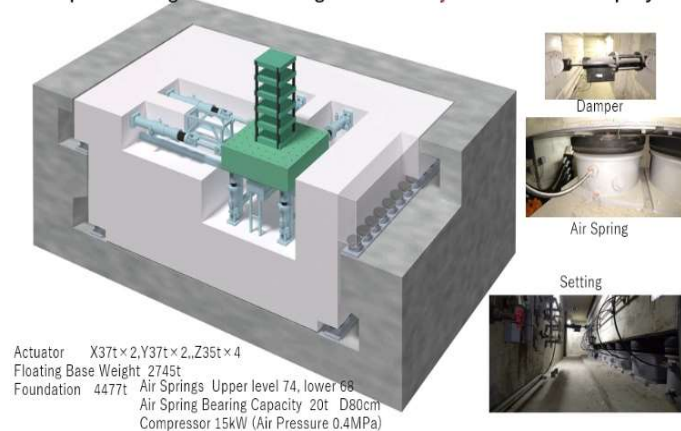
Base Isolation for Shaking table foundation (Tokyu Co.)
